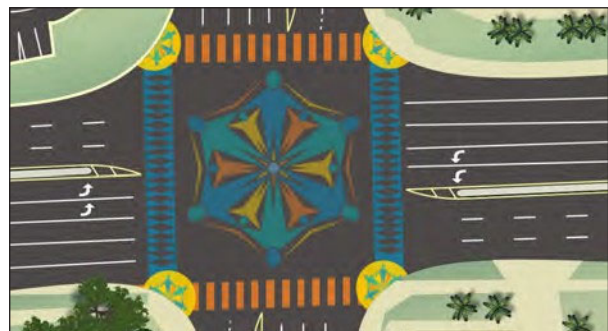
Wilmington Avenue and East 120th/East 119th Street intersection
